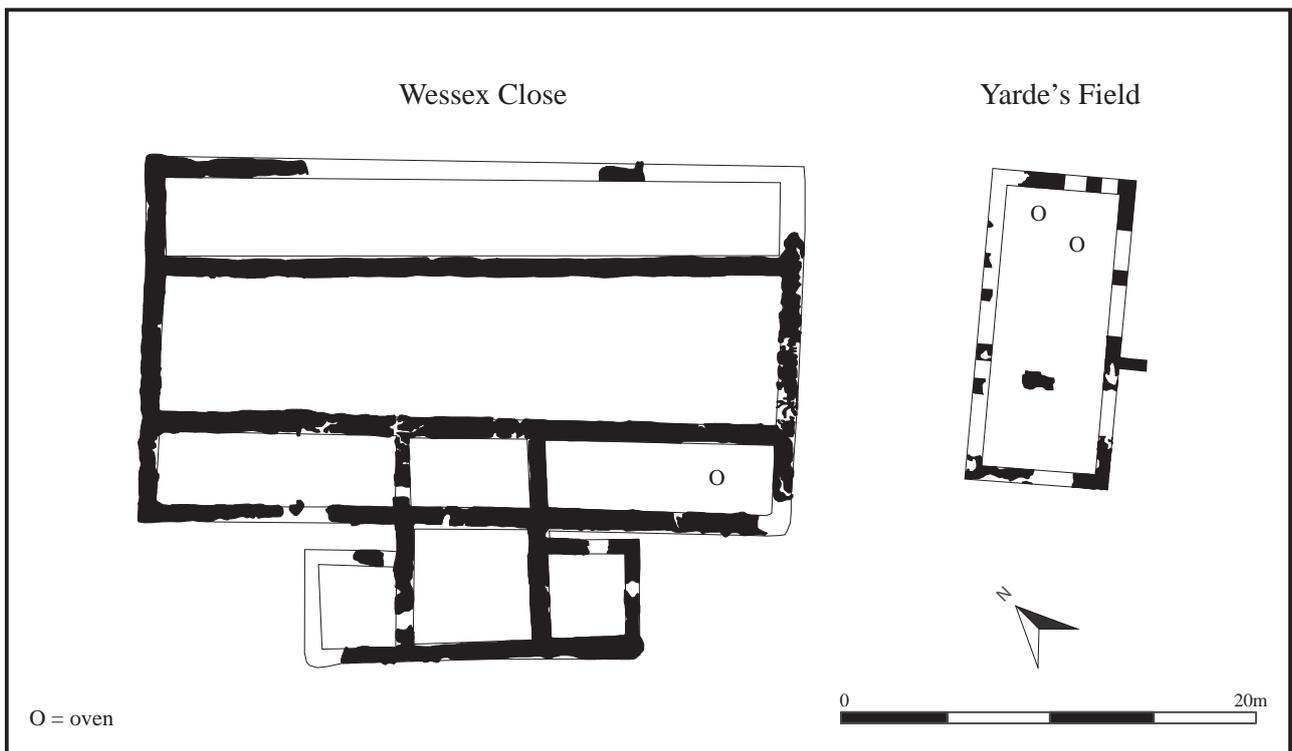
Plans of two Roman masonry buildings in Topsham (drawn by David Gould)
